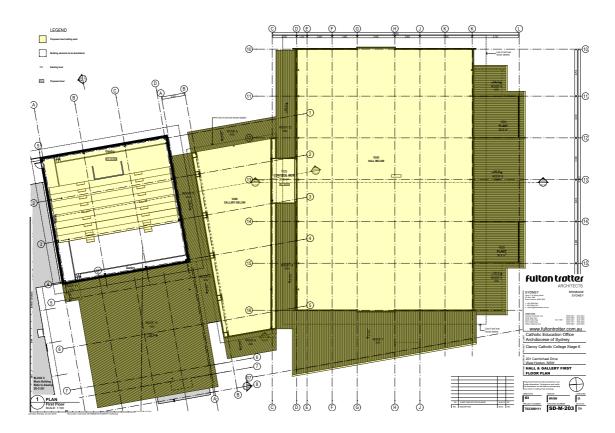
Plan of proposed development – Performing Arts and Music buildings (First Floor)
